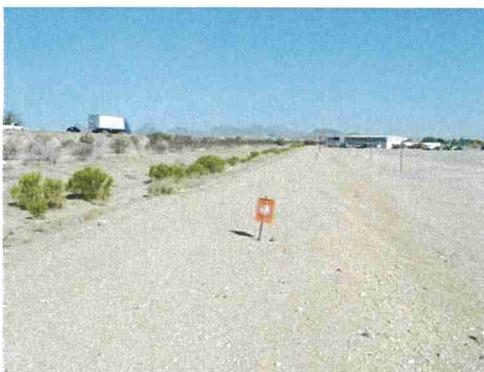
Looking west at the end of Michigan Street; Tucson Mountains in the background
